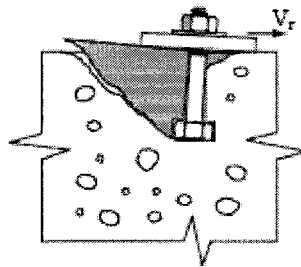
“Concrete pryout resistance of anchor in shear” (CSA A23.3-04)
